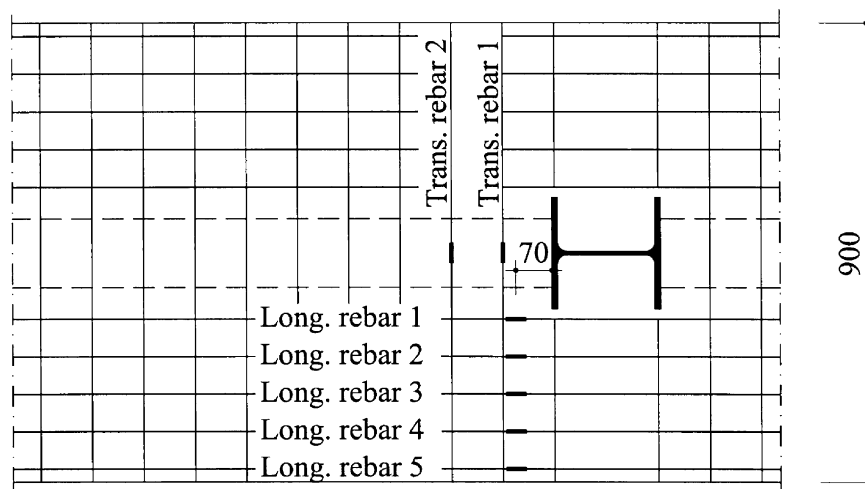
Detail of the instrumentation of the slab reinforcement.
